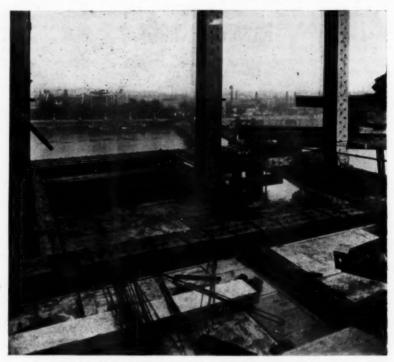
WARMING PANEL ON SHUTTERING READY FOR CASTING
